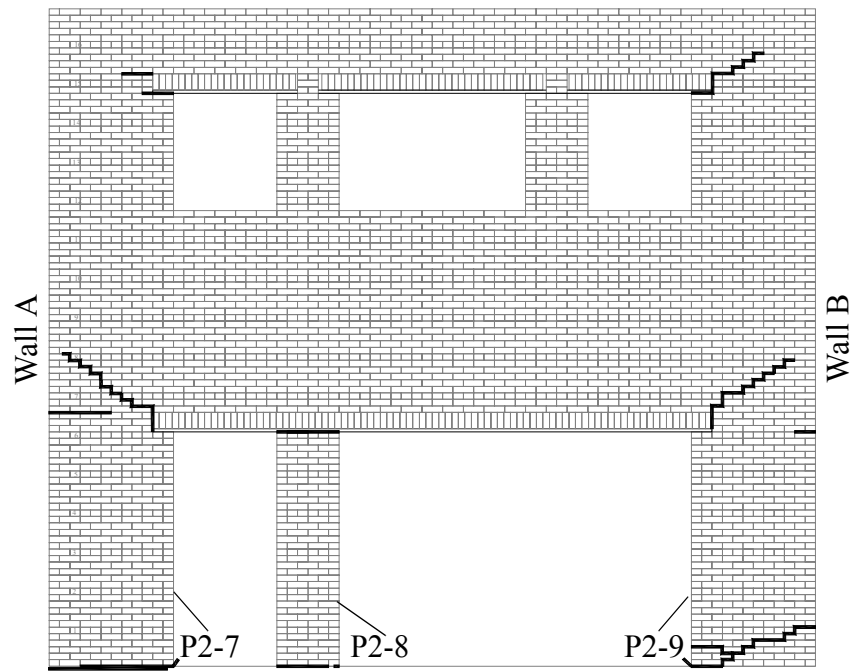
Crack pattern of Wall 2 following Test Run 10.
